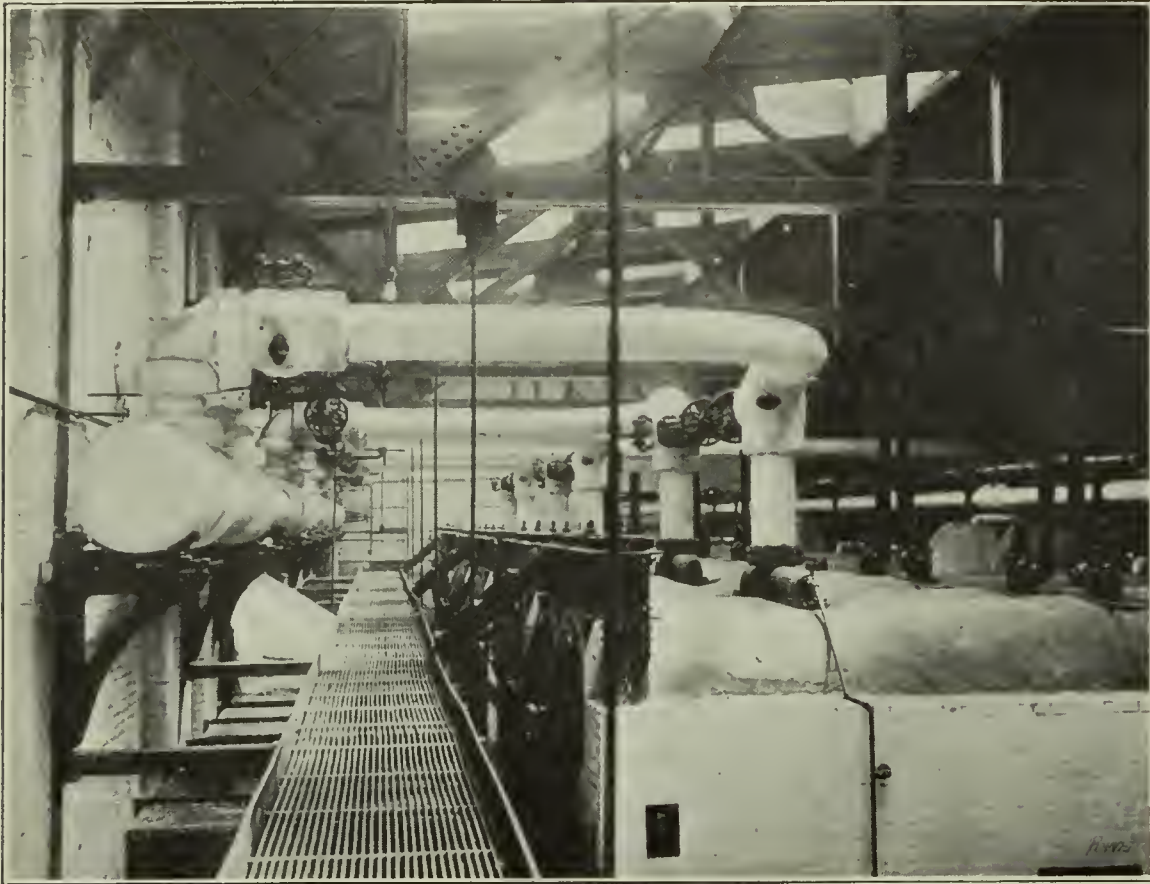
LAYOUT OF PIPING OVER THE BOILERS
